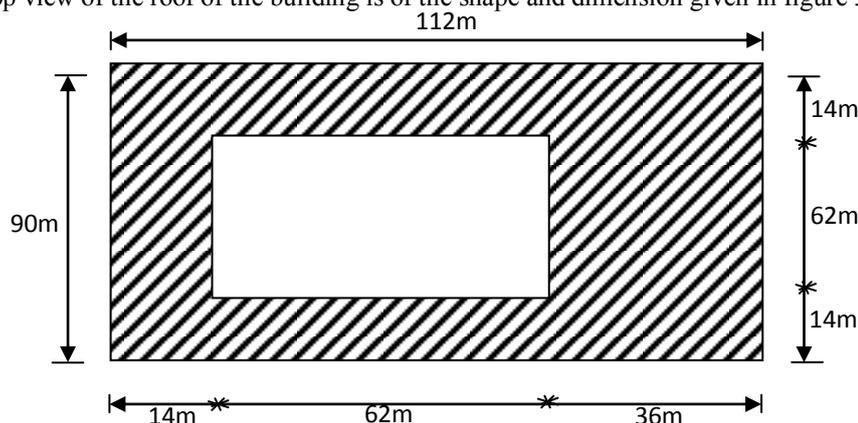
Top view of the roof of the UNIPORT faculty of science building, Ofirima.
